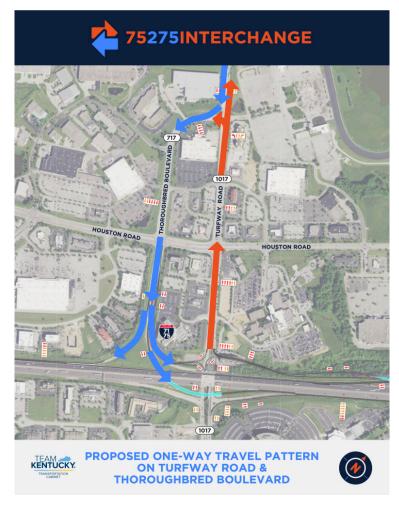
Proposed one-way couplet at Turfway Road and Throroughbred Boulevard.
